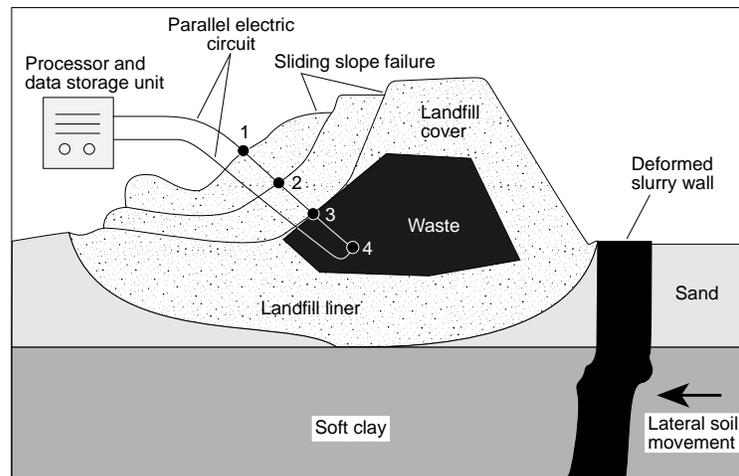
A schematic illustration of the use of an electrical shear strip to sense the flow failure of a landfill cover (Inyang, 1994b)
